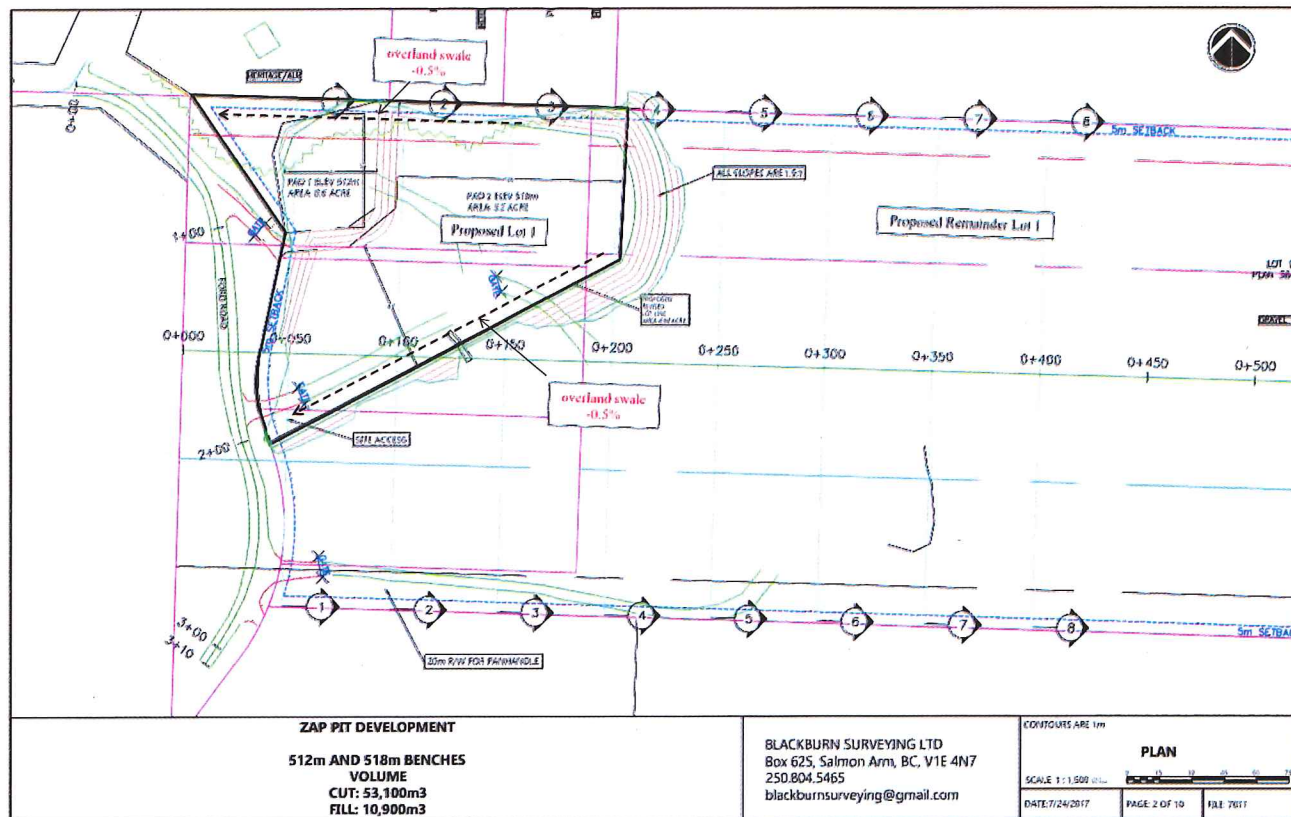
Proposed Lot Layout and proposed reclamation of proposed Lot 1.
